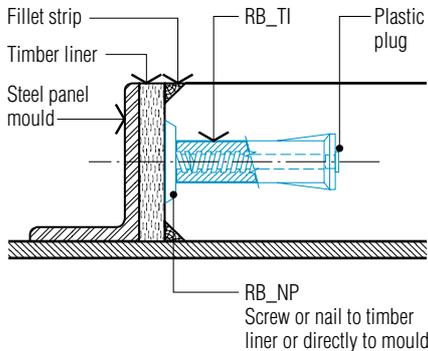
THREAD INSERT TO EDGE OF PANEL
